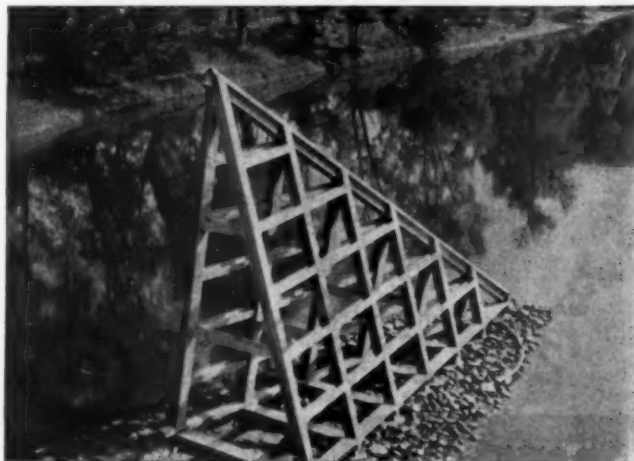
Close-up of Ice Breaker Showing Welded Construction
